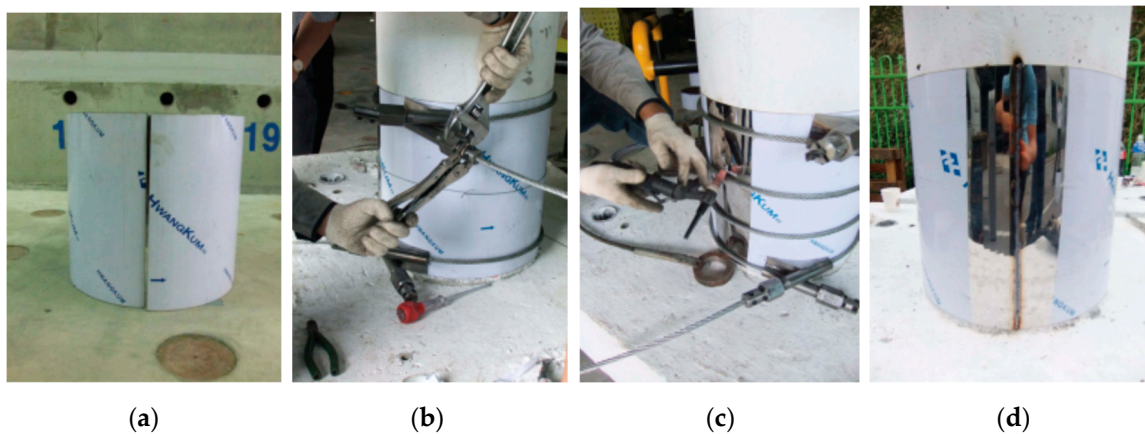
Jacketing with prefabricated steel sheets: (a) Cutting to shape of steel plates; (b,c) Installation of steel plates and exertion of external pressure using cable and a cross device; (d) Welding to complete the jacketing process [19-ICE Publishing Copyrights].
